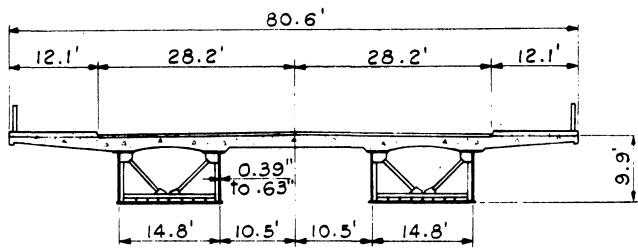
Schloss Bridge, Mulheim-on-Ruhr, Germany. Spans 138 ft-145 ft-138 ft. A three-span continuous twin steel box with composite concrete deck. The deck is prestressed both laterally and longitudinally
